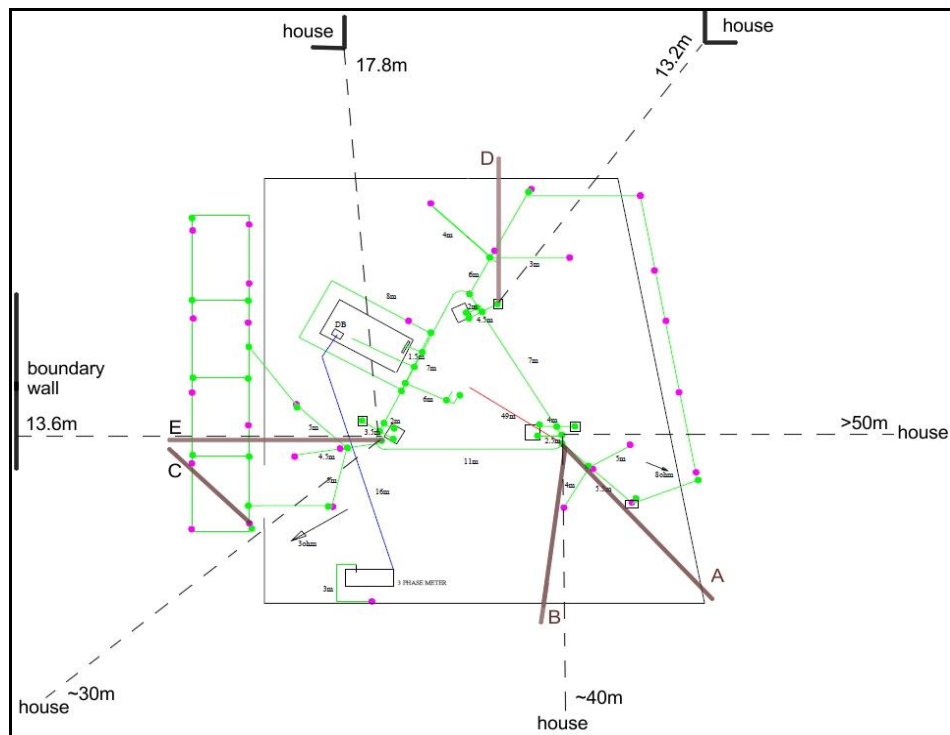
Earthing arrangement of the Atalugama site- actual earthing arrangement
